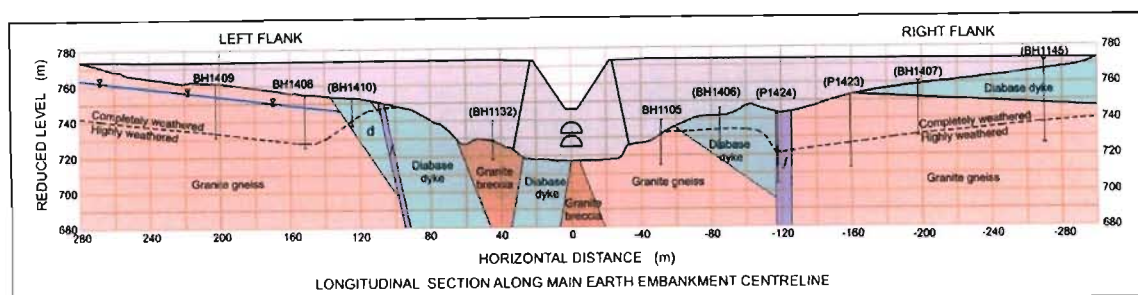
Geological cross section along dam centreline (post excavation of foundation footprint).
